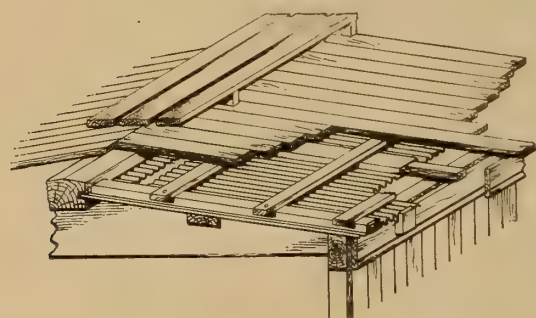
CORRUGATED INSIDE IRON ROOF.
